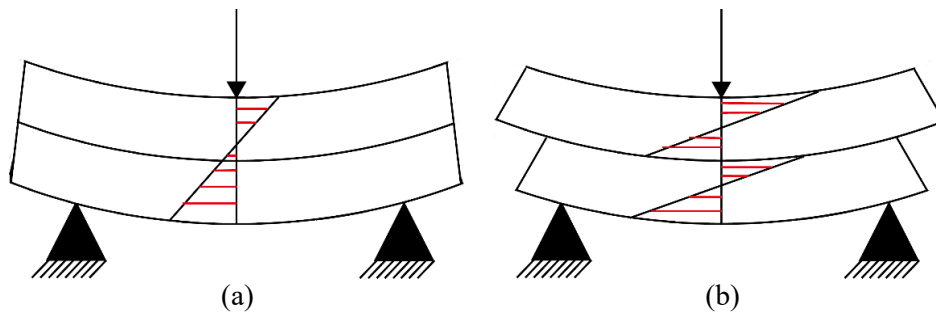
Stress distribution: a) Full bonding pavement structure; b) Poor bonding pavement structure.
